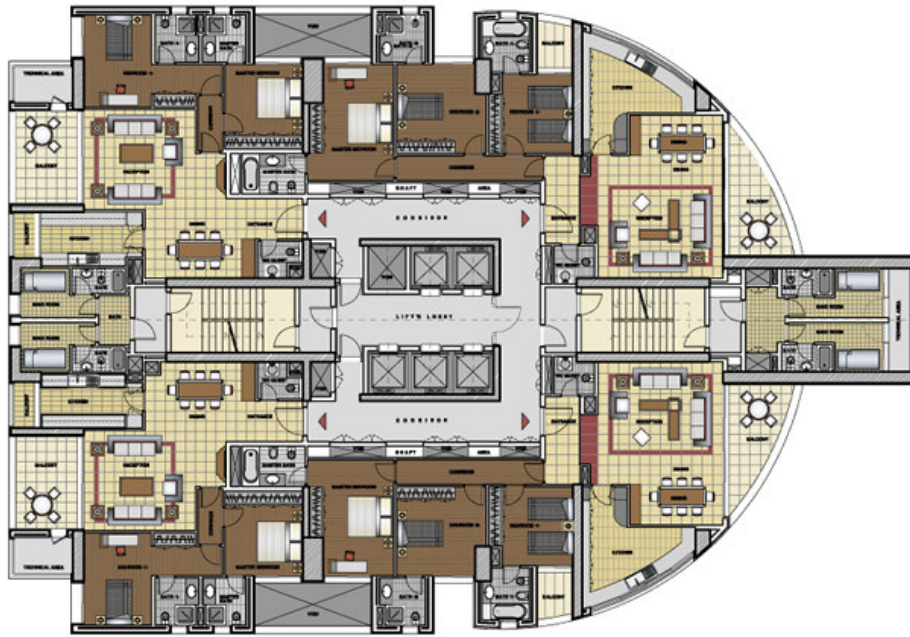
Typical floor-plan of the Black Pearl - Eko Atlantic Towers.
